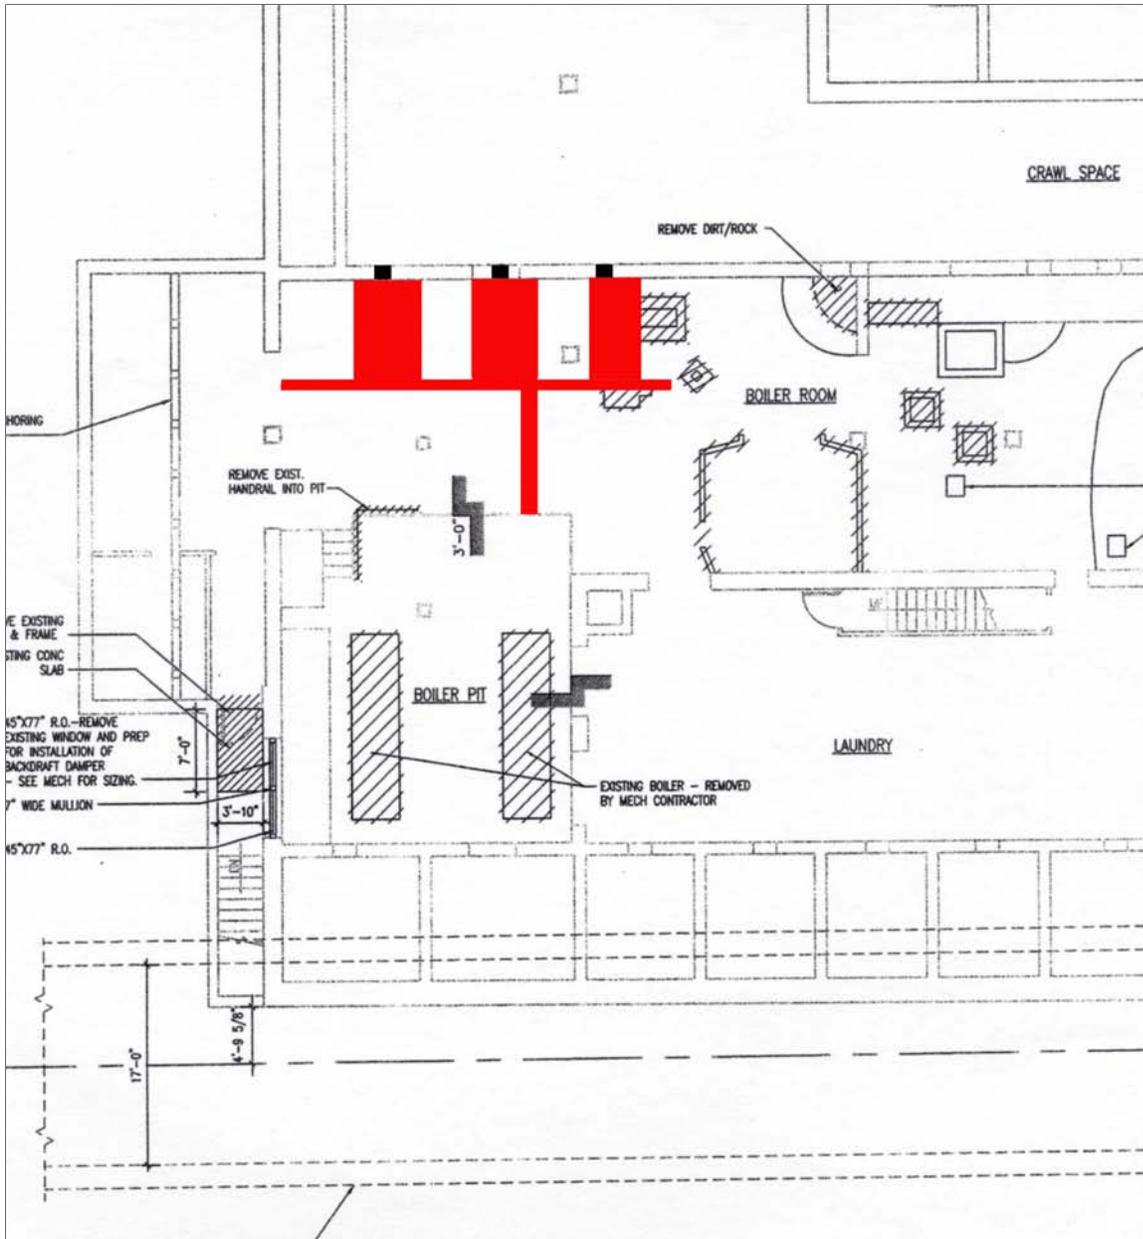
Basement floor plans for the Quapaw Bathhouse (adapted from National Park Service 2002a: Sheet M4.Q).
